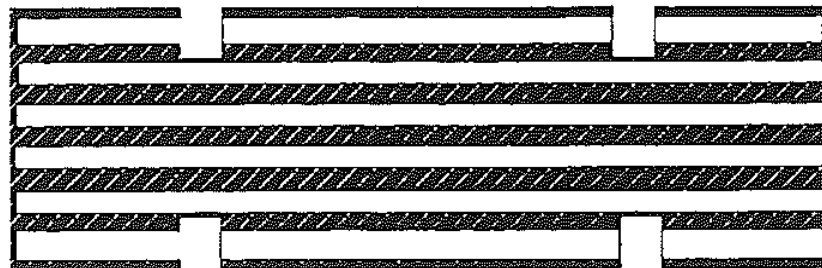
Section side view of Pelham bearing; dimensions 596 x 394 x 182 (high) mm; internal rubber layers 18 mm thick, though the middle one is closer to the nominal 20mm; steel plates 11.4mm thick except end ones which are 15.8mm.
